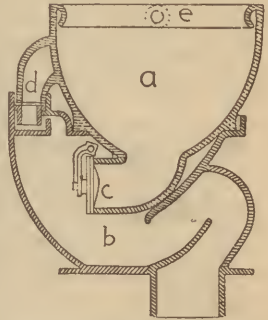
Tylor & Son's Side-outlet Valve-Closet.
